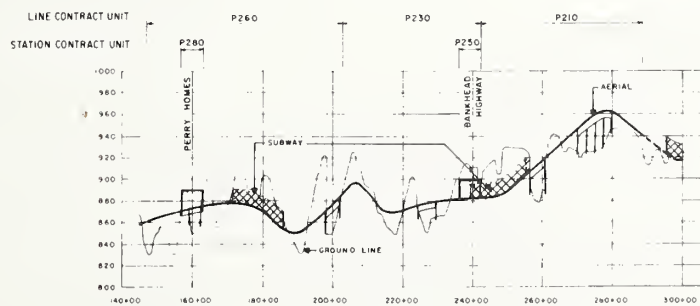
TYPICAL PROFILE - WEST LINE [10-6]
